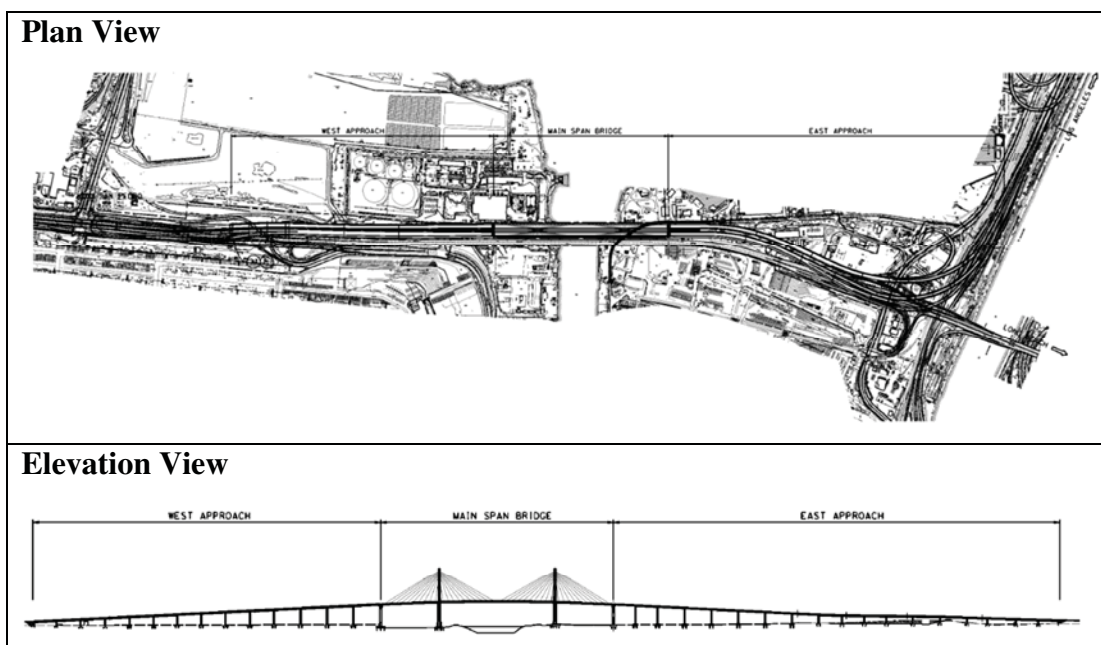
Gerald Desmond Replacement Project plan and elevation view.
